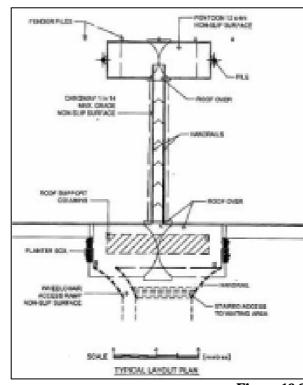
Typical Layout Plan for Type One Ferry and Tour Boat Terminal
